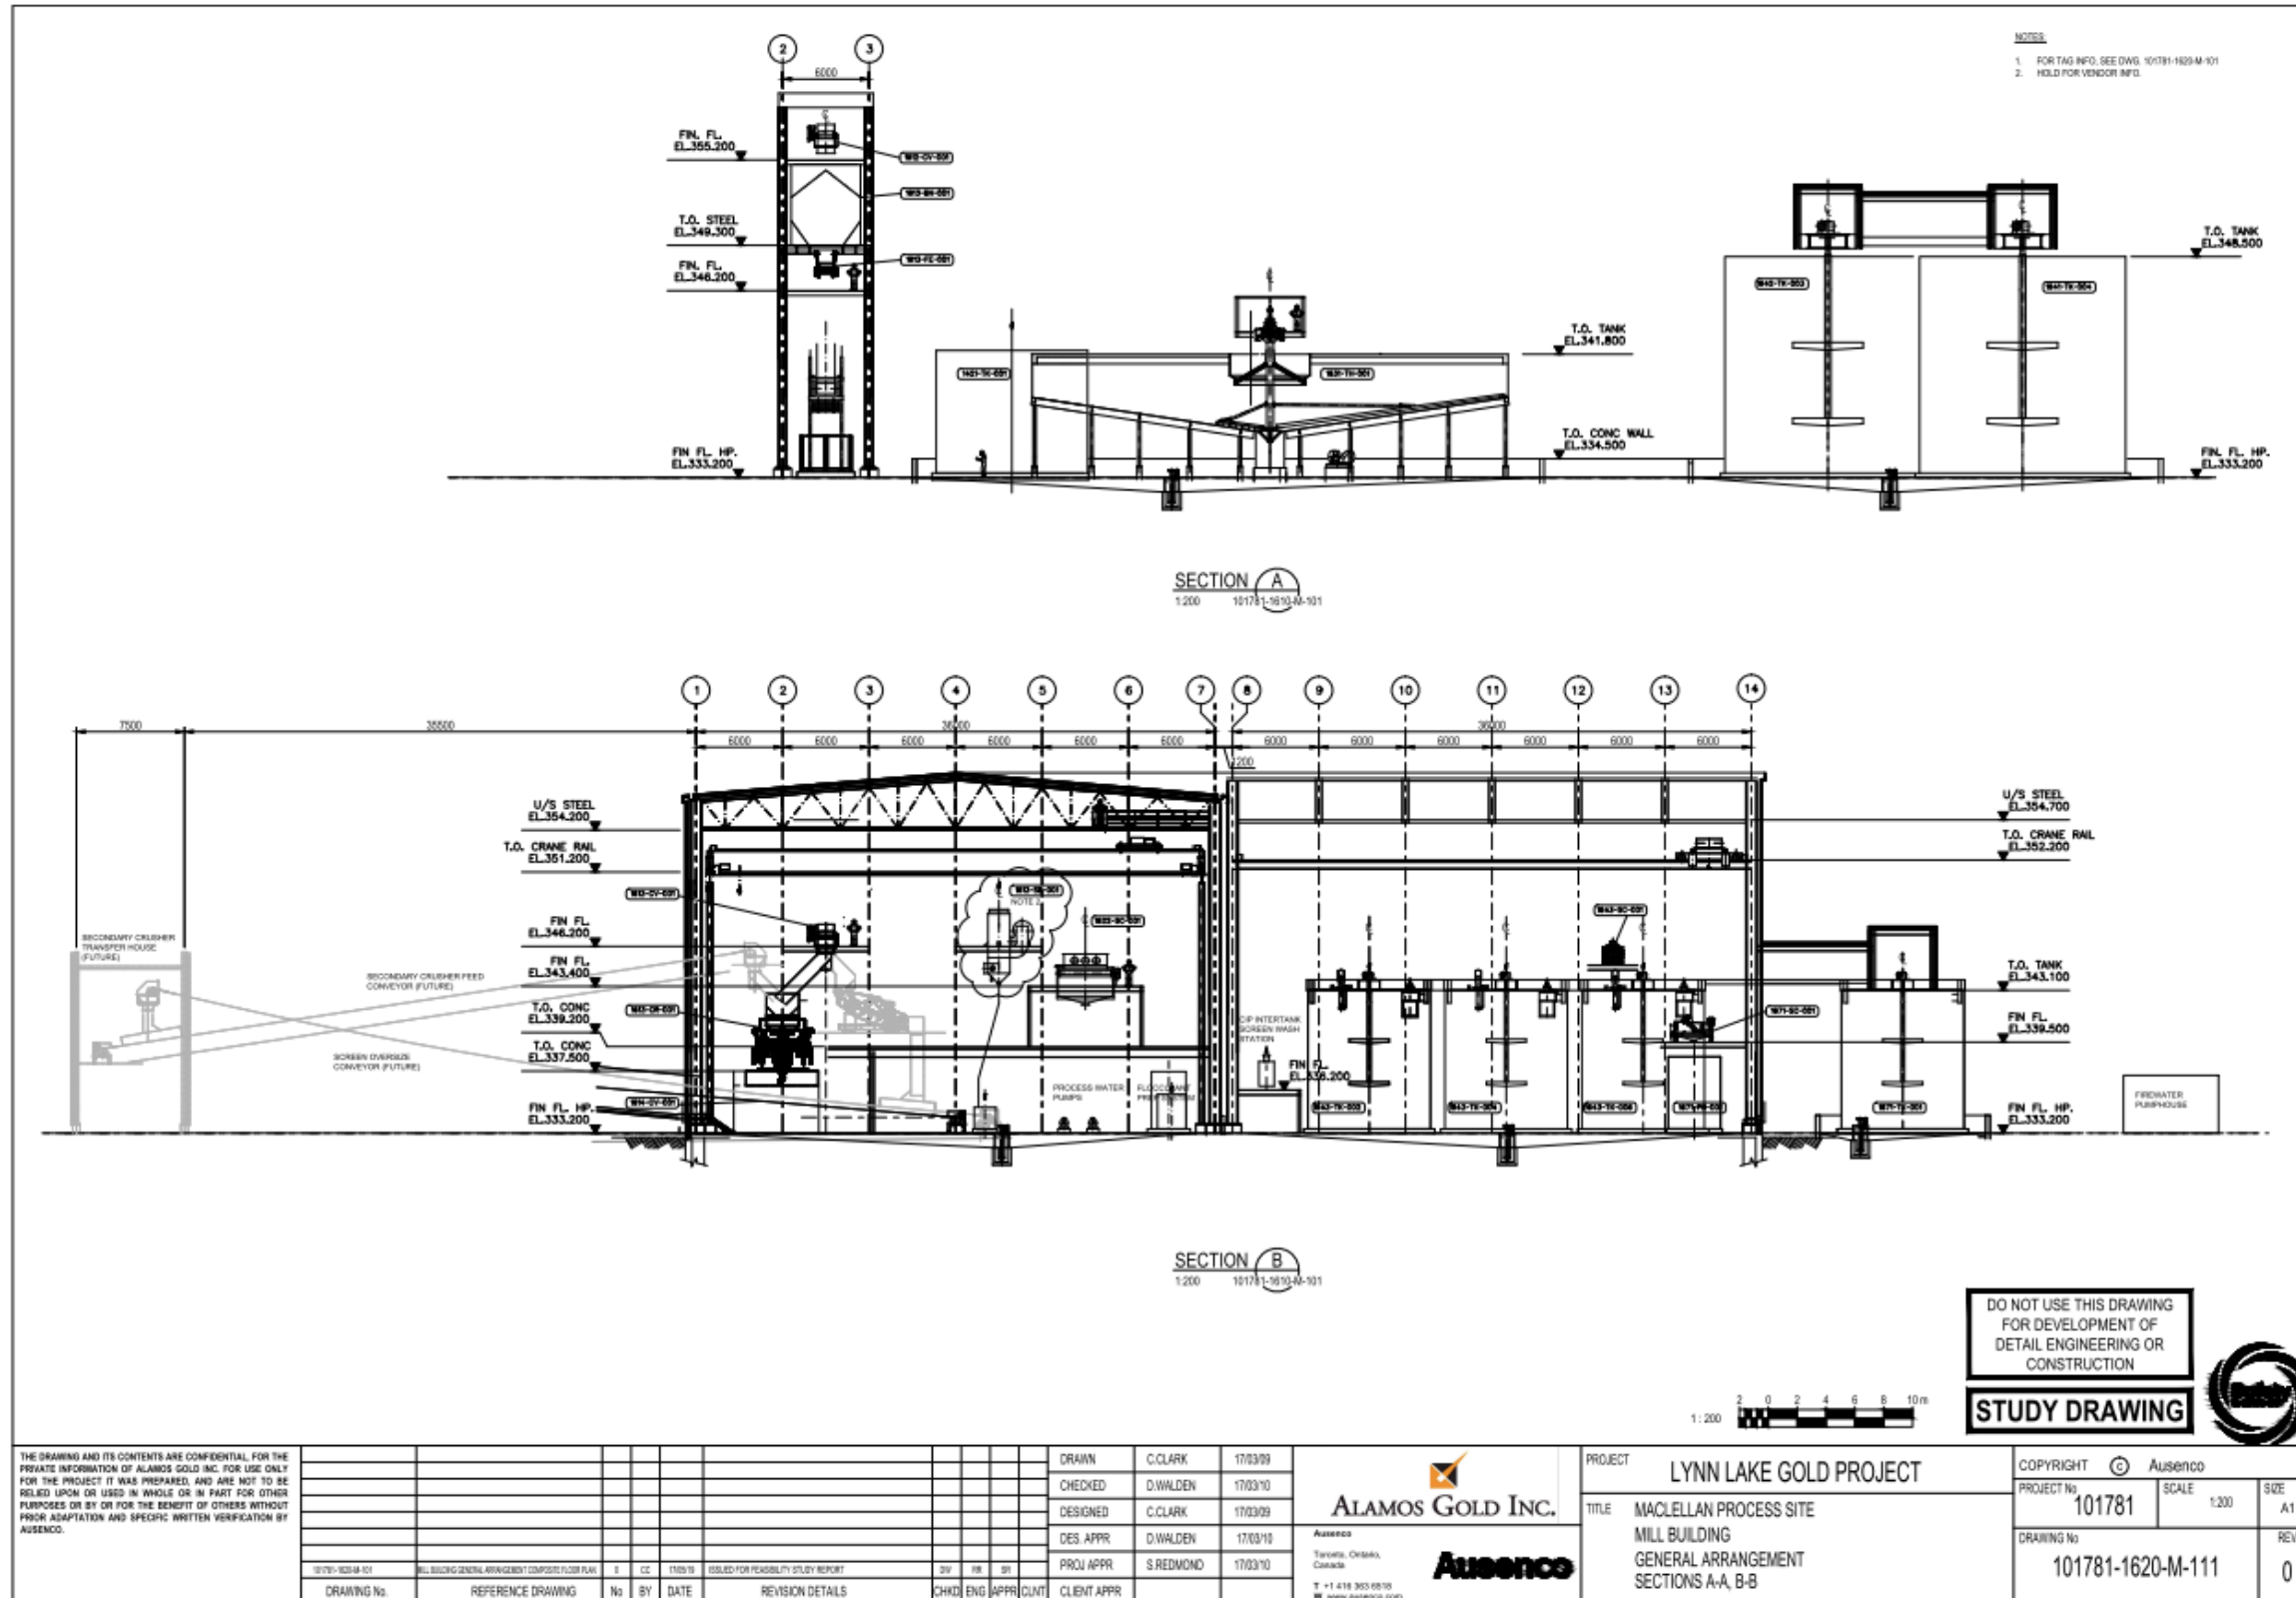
MacLellan Mill Building General Arrangement, A-A and B-B
